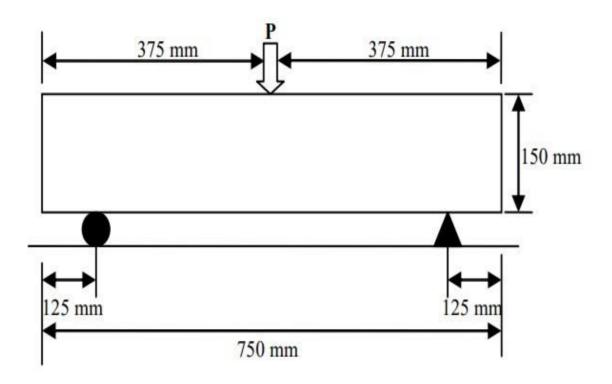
Test Setup for flexural strength test of RCC Beam
